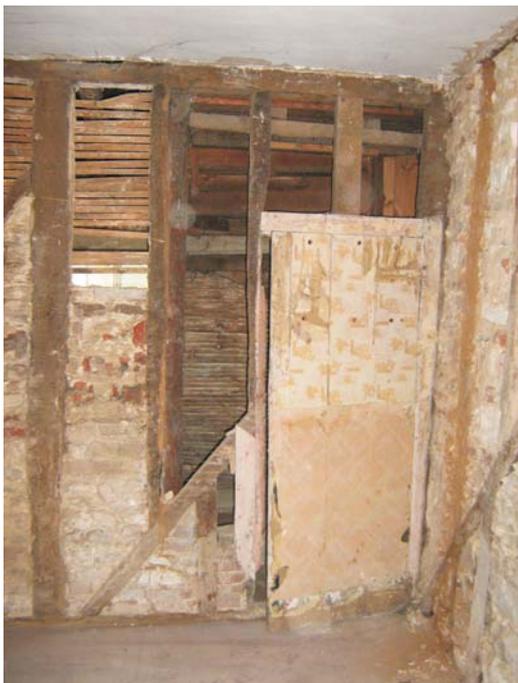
The south wall of the sitting room with inserted doorway overlain by successive layers of mid to late 20th century wallpaper when the door was no longer in use
